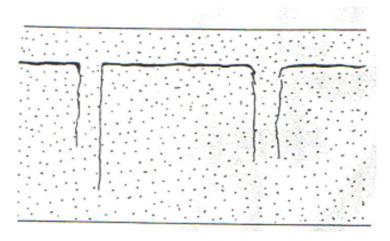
Cracking of the coating at the connection between reinforced concrete structures and masonry filling
